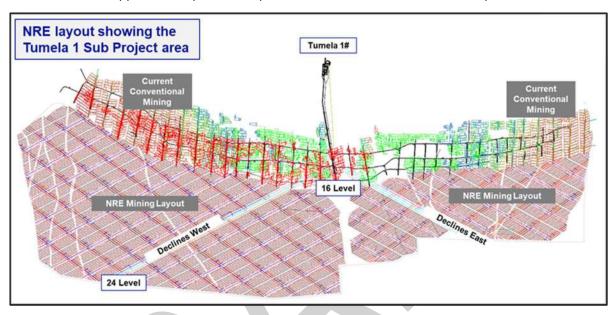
Tumela 1 Sub Shaft UG Layout
